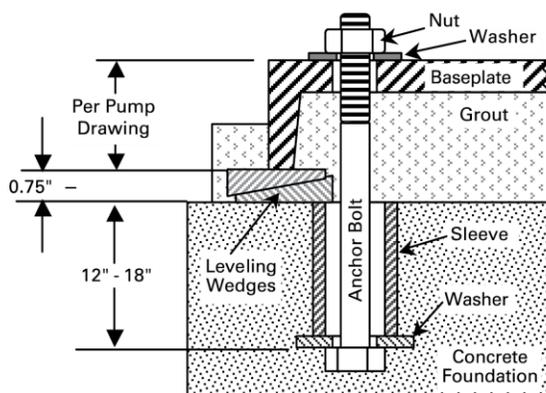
FIGURE A – TYPICAL ANCHOR BOLT (SLEEVE TYPE)
